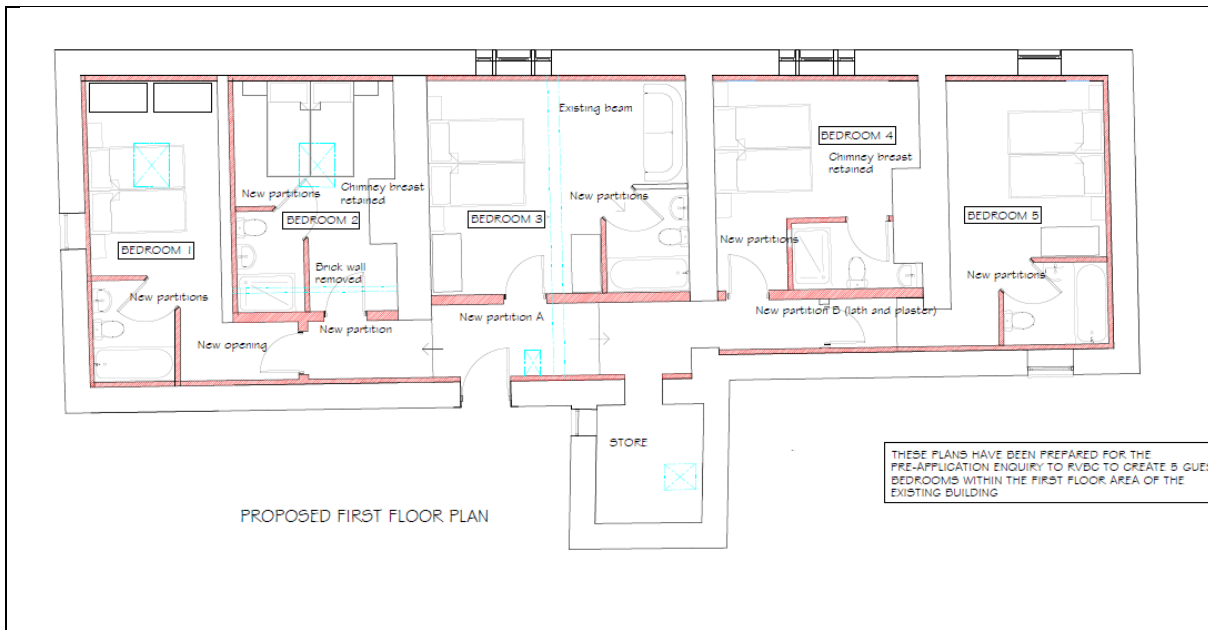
Proposed 1<sup>st</sup> Floor Layout
